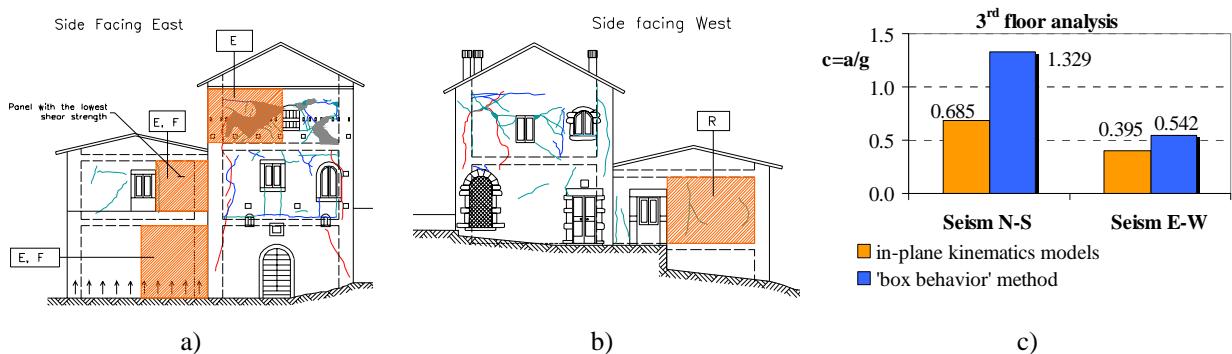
Results of method adopting the “box behavior” of the structure: (a) the most damaged panels (East side) are given as simply reaching the elastic (E) or first crack limit (F), whereas the panel led to rupture (R) belong to a very low damaged wall (b); comparison between the two methods (c).
